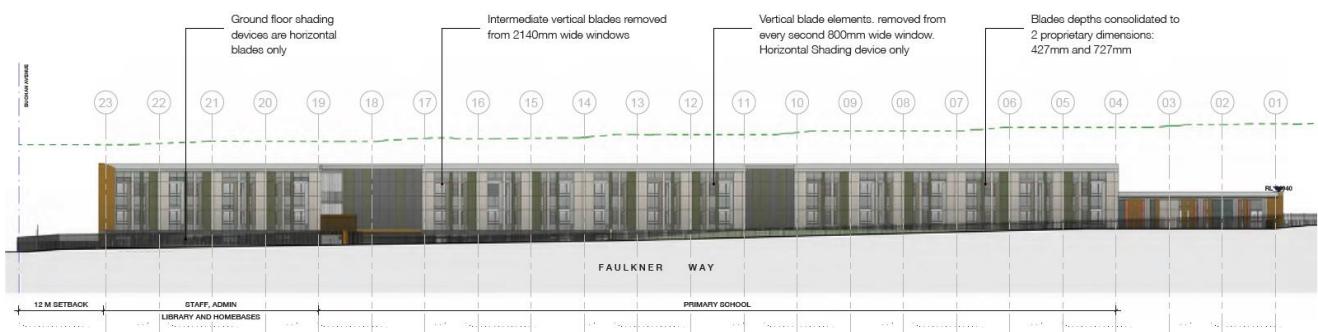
Extract of amendment to western elevation (Faulkner Way) (Source: TKD)
